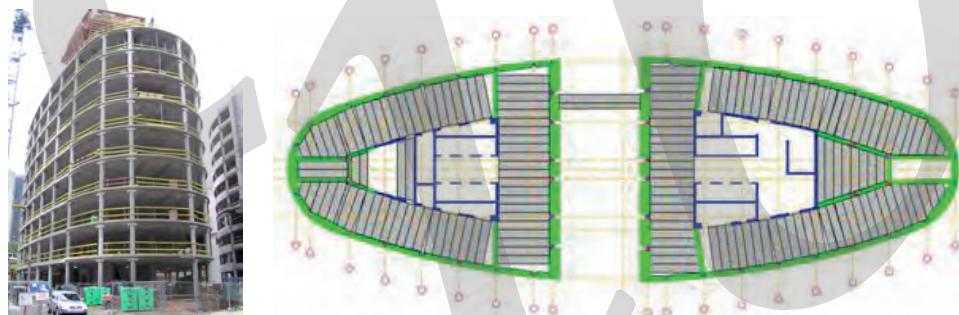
Precast skeletal frame structure of 26 storeys with elliptic floor layout
